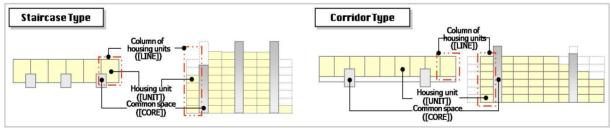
Elements of an apartment building ([BUILDING], [LINE], [UNIT] and [CORE])
